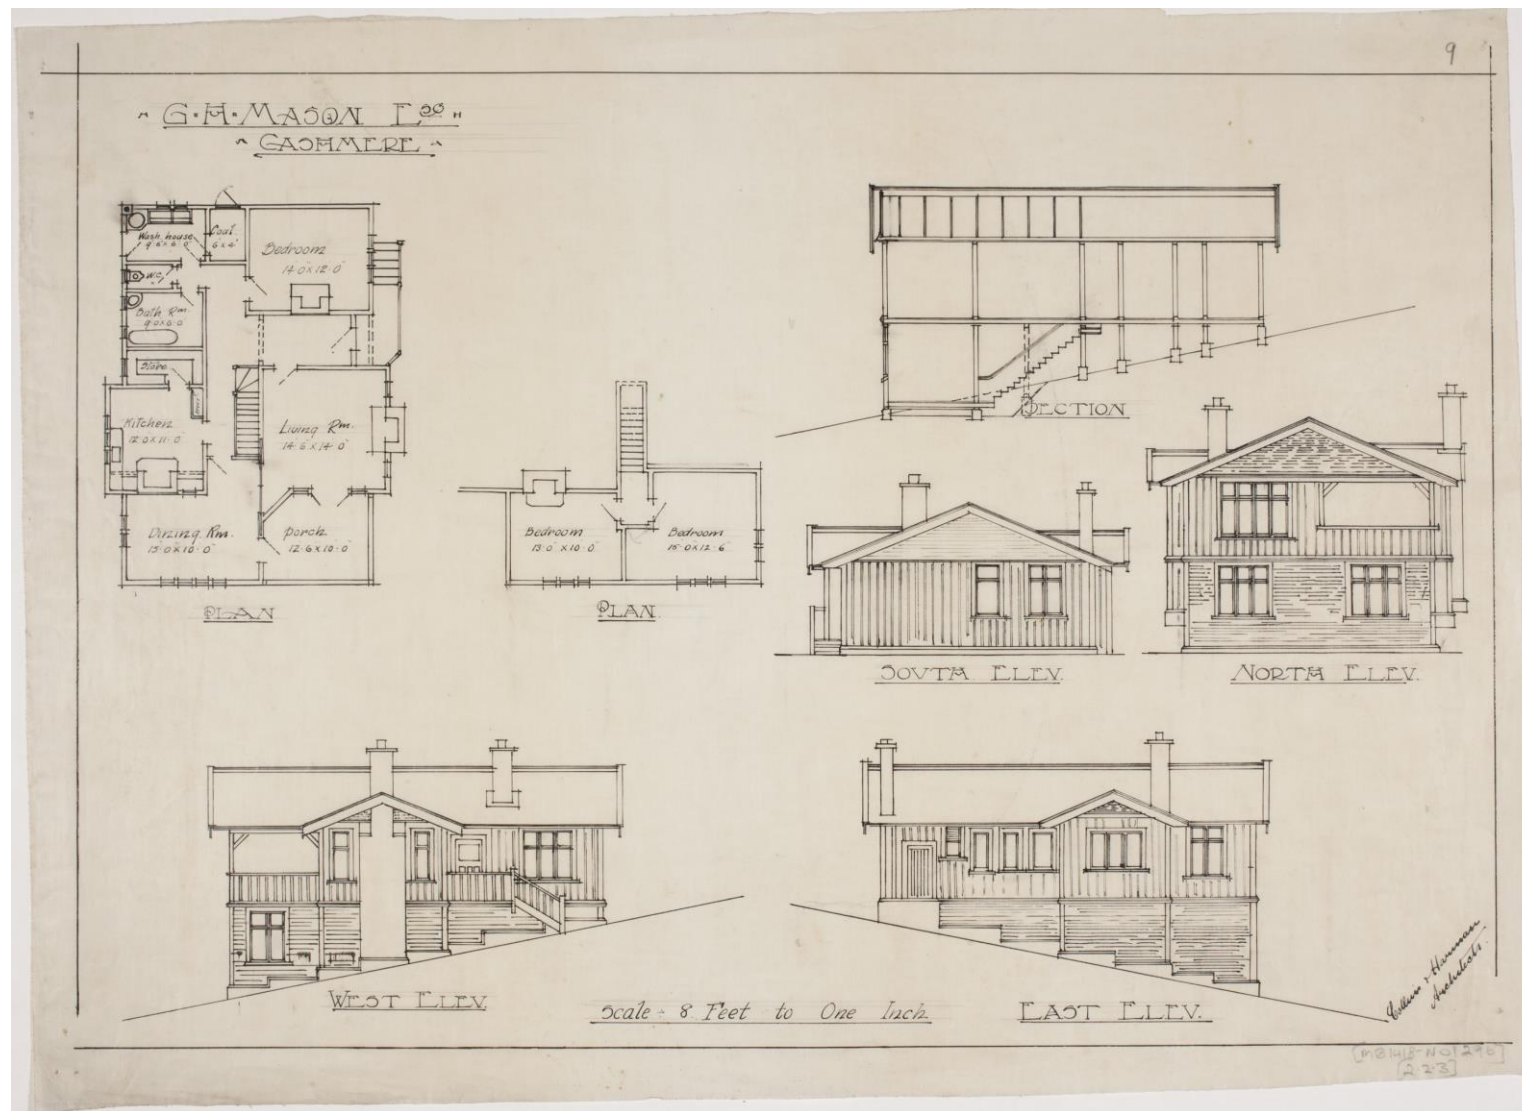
Collins and Harman, G. H. Mason, Esq., Cashmere, plans, elevations and section (1919).
